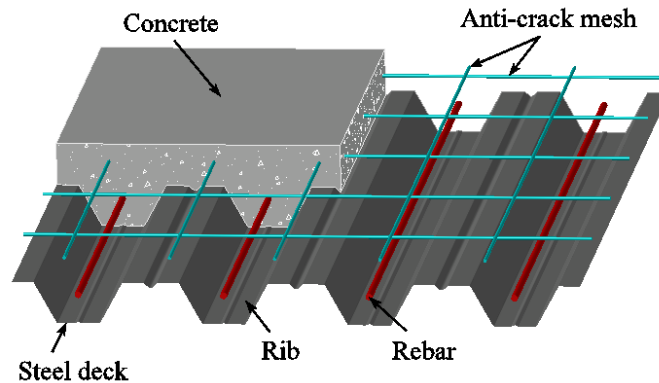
Typical layout of a composite slab with trapezoidal steel deck.
